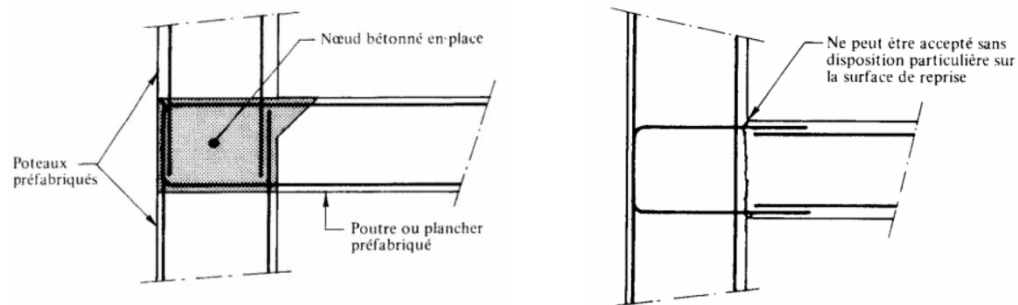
Beam-column joint details A & B from Regles BAEL 91 (Beton Arme aux Etats Limites), 2006. Details show column bars spliced in the beam-column joint and beam bars spliced at the face of the joint
